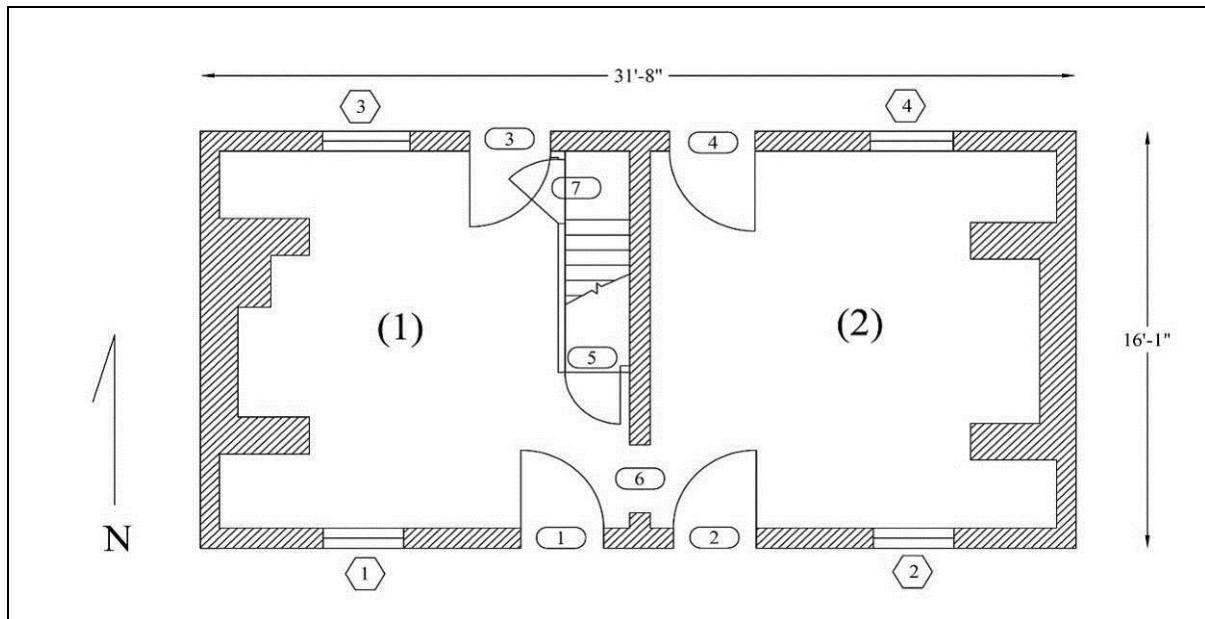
Sherwood Forest Kitchen/Quarter, Detailed First Floor Plan.
